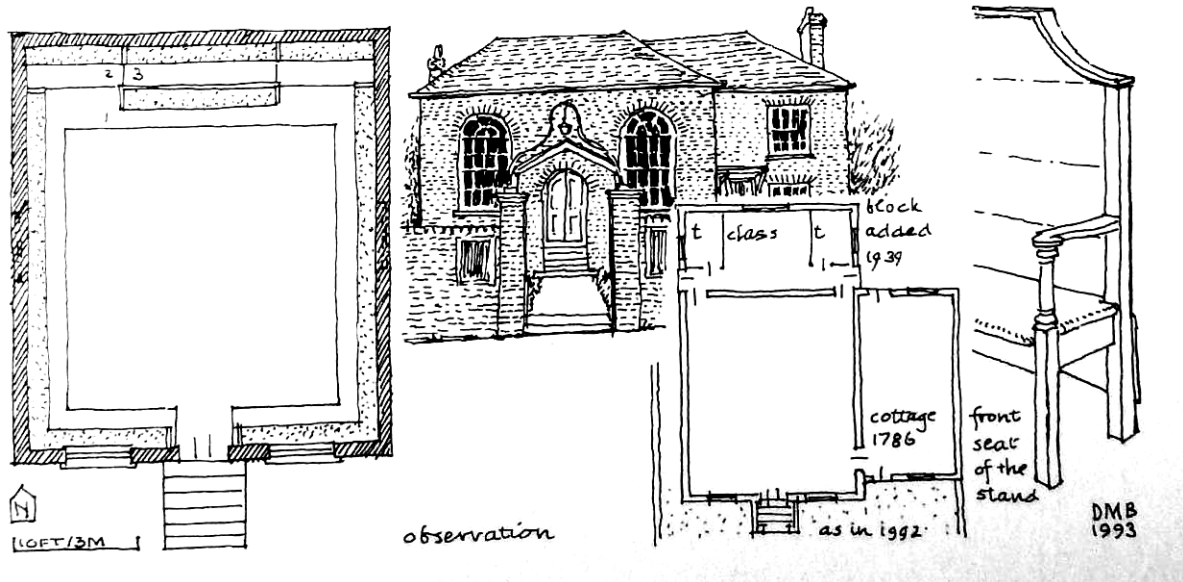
Original plan, elevation, plan as in 1992 and detail (Butler, *The Quaker Meeting Houses of Britain*, 1999, vol. 2, pp. 605)
